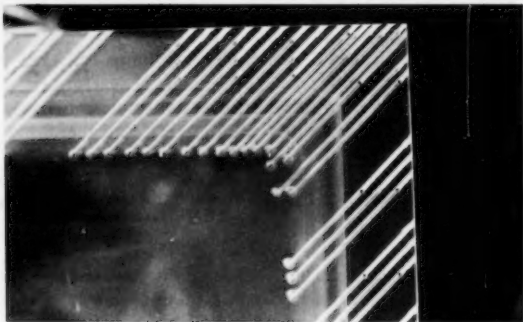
Detail of Model with Large Eave Section (Roof Corner)
